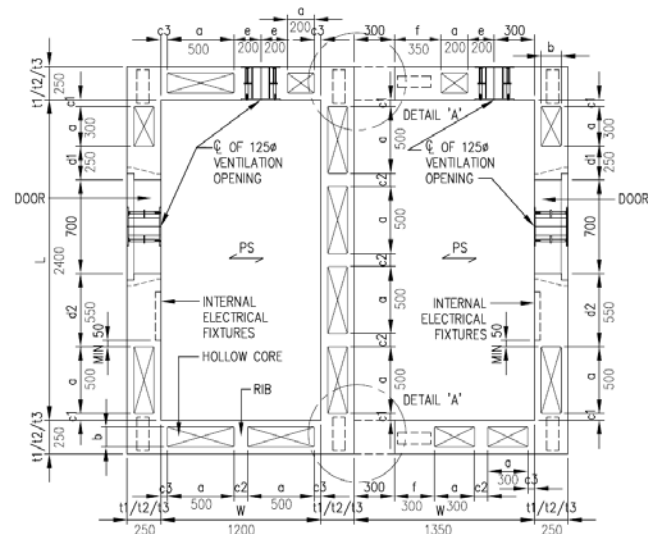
PRECAST HS AND C-SHAPED PRECAST HS CONNECTED AT THE LONGER WALL AND WITH HS DOORS ON LONG WALLS (TYPE 5)
